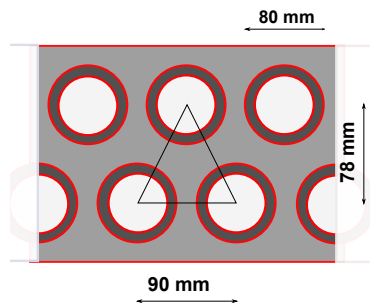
Section of a vault with two staggered layers of fusée elements.
